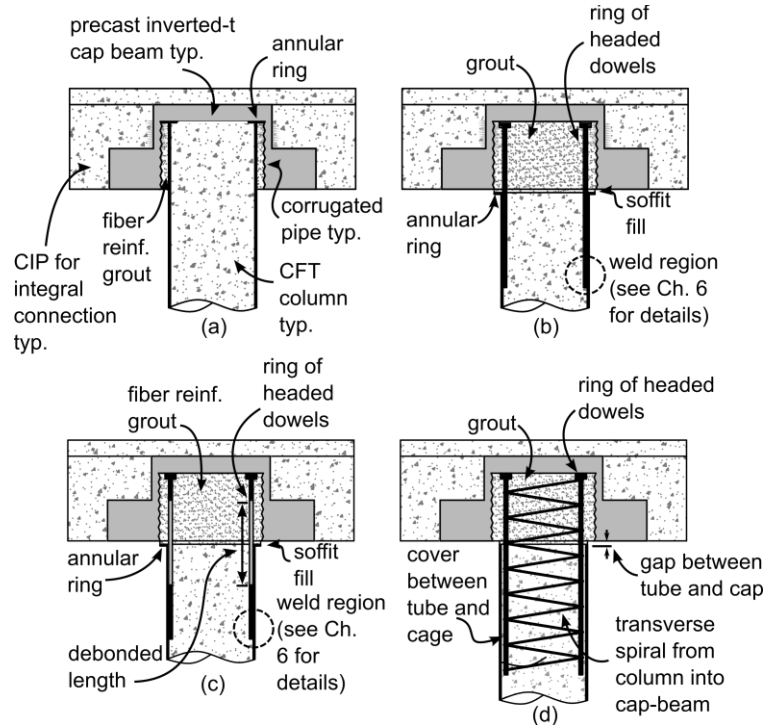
Proposed Connection Types, (a) Embedded Ring Connection (ER), (b) and (c) Welded Dowel Connections (WD), and (d) Reinforced Concrete Connections (RC)
